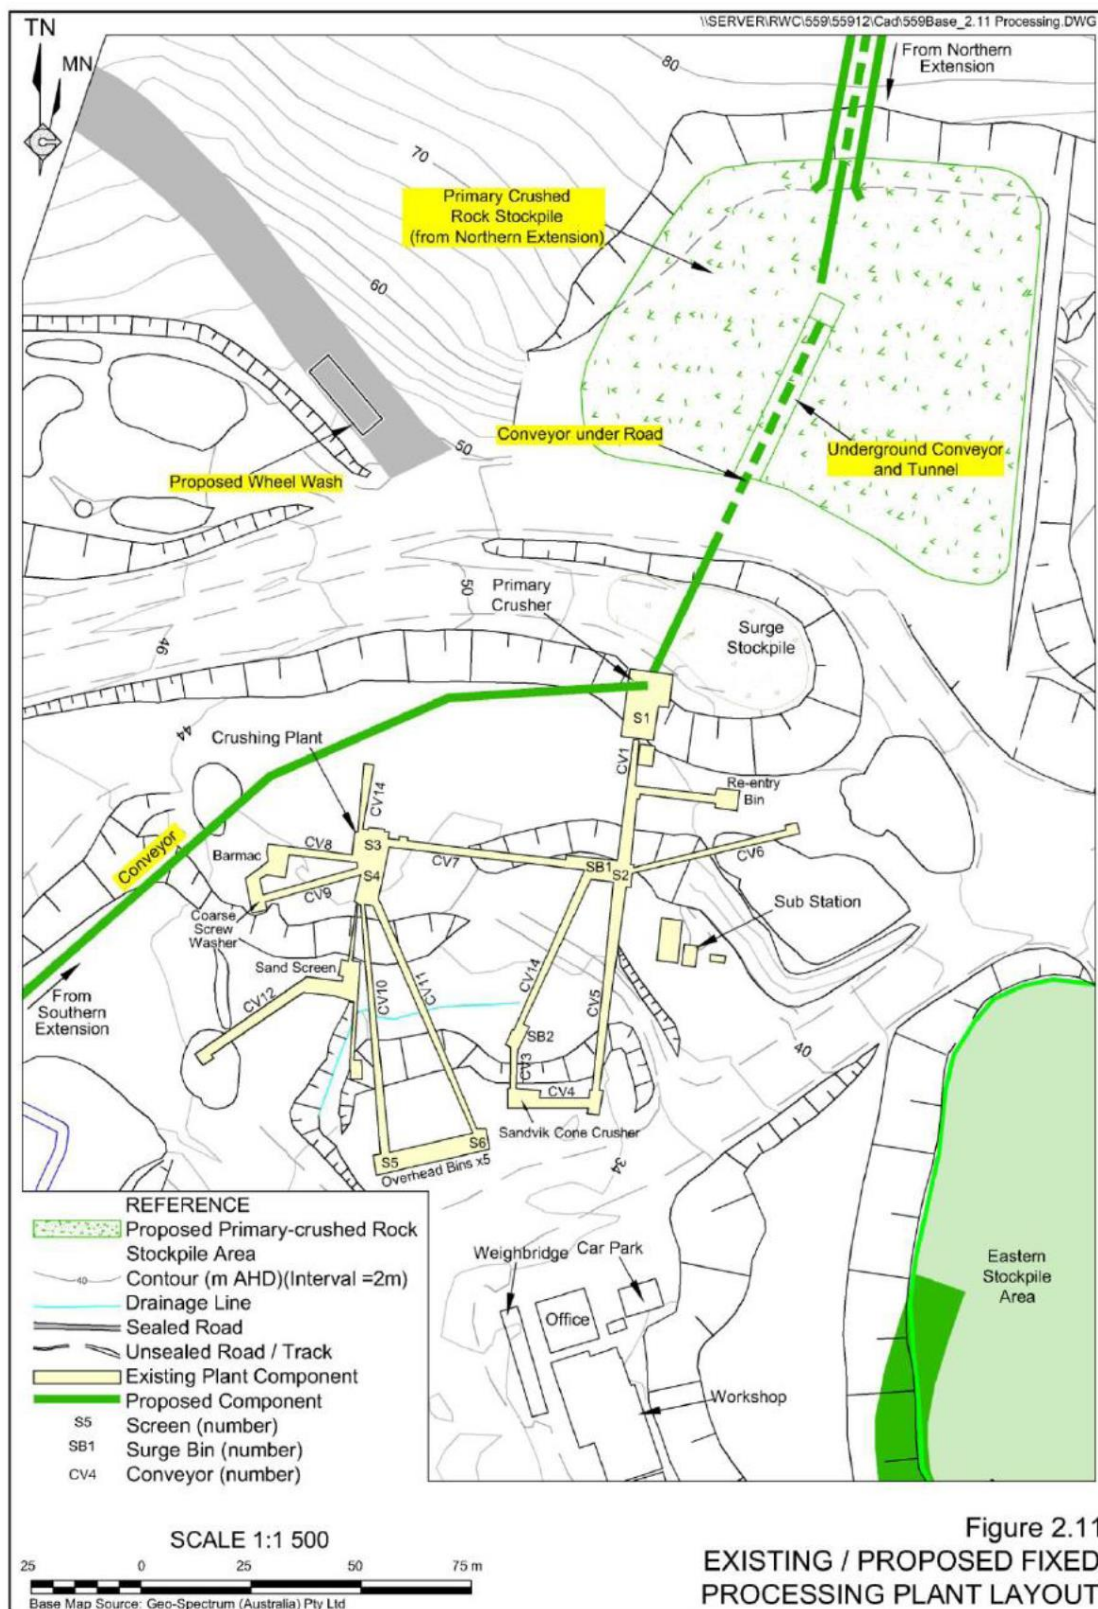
Existing / Proposed Fixed Processing Plant Layout
